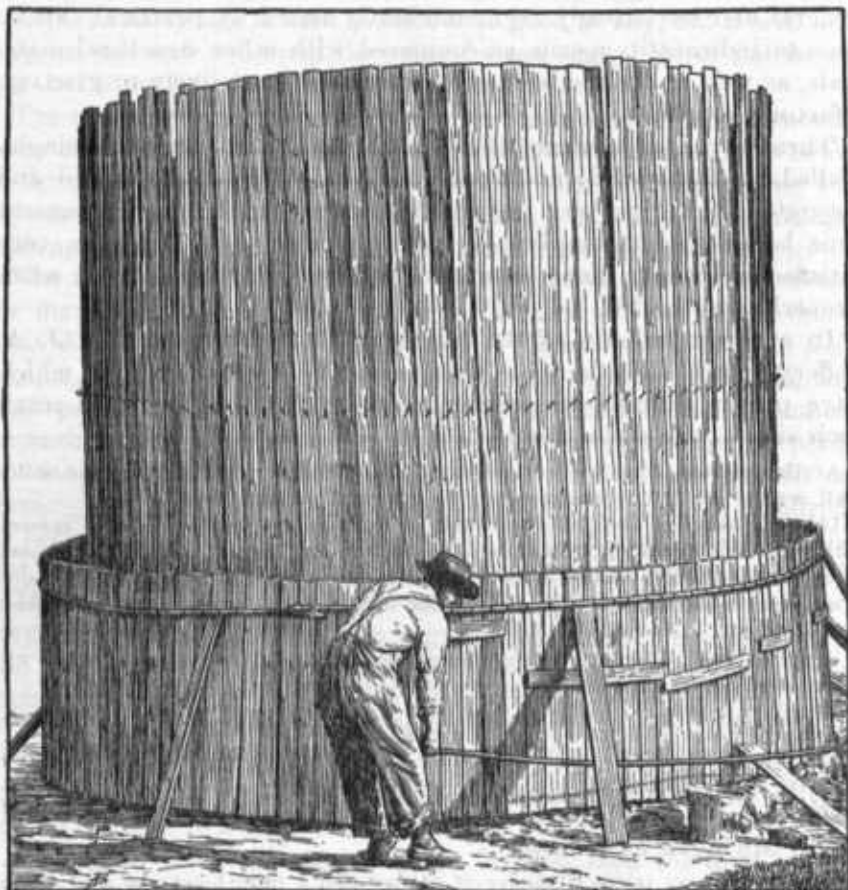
Setting up the forms for the construction of a single-walled silo.
